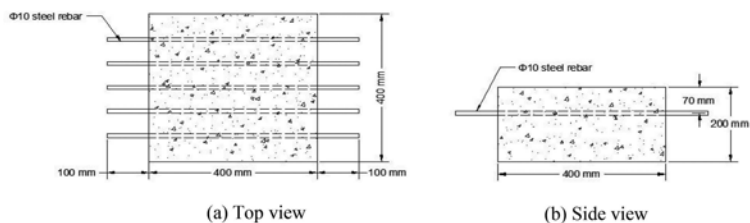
Reinforced concrete specimen detailing; (a) Top view, (b) Side view.
